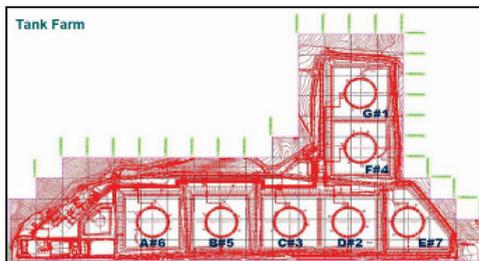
General plan of Ceyhan Marine terminal tank farm.
